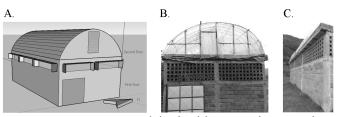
3D geometry of the building: postharvest plant (first floor) and solar dryer of coffee (second floor) (A), front facade (B), side facade (with windows in perforated brick) (C)
